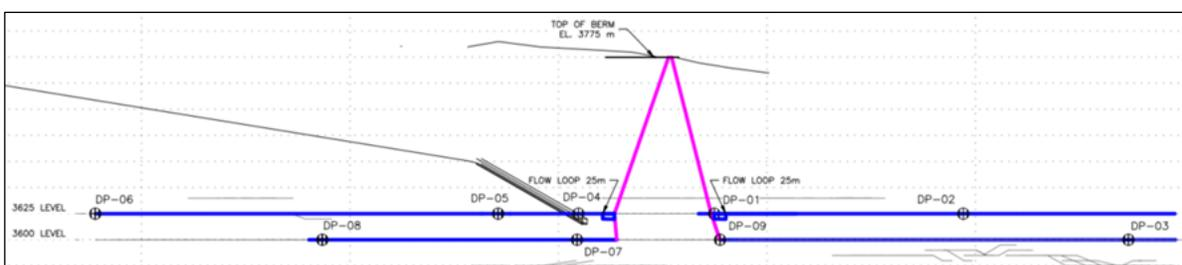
Schematic Diagram of Underground Workings – Pipeline Profile (Mine Elevation)
